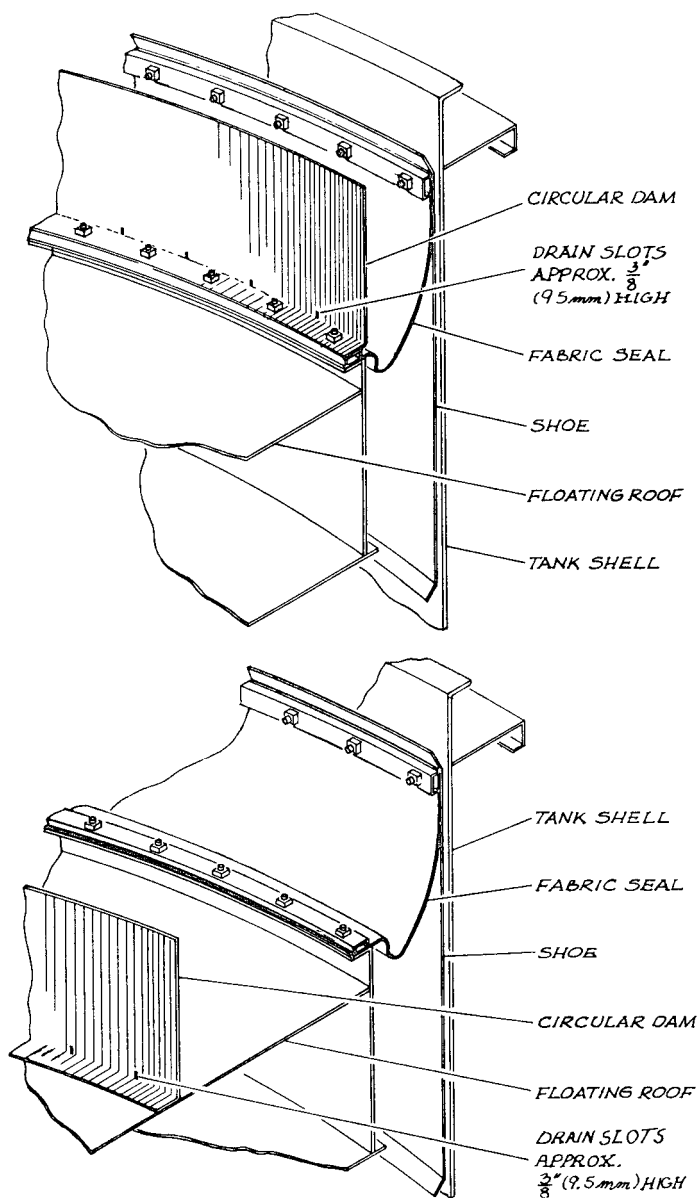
(c) Typical foam dams for floating roof tank fixed protection.
